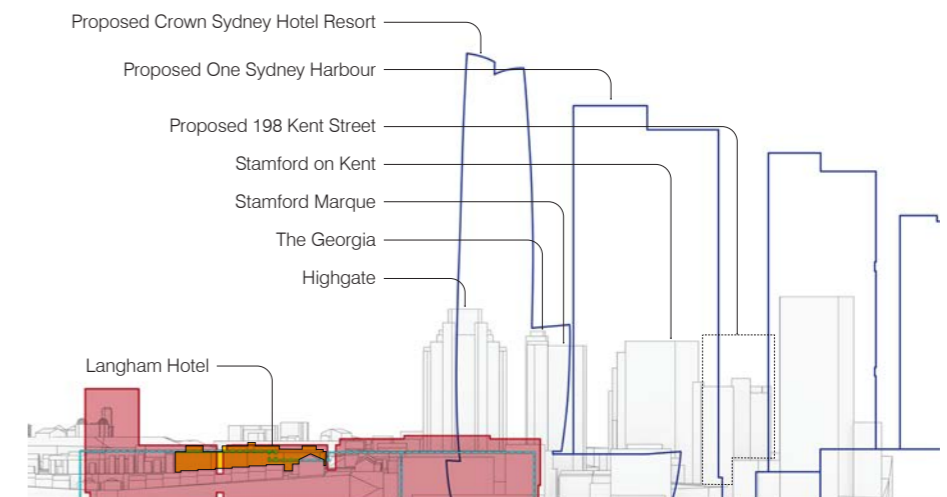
Elevation Looking East - MOD 9 with the Approved Concept Plan shown in light blue outline (Source: Modified from HASSELL diagrams (October 2020))
